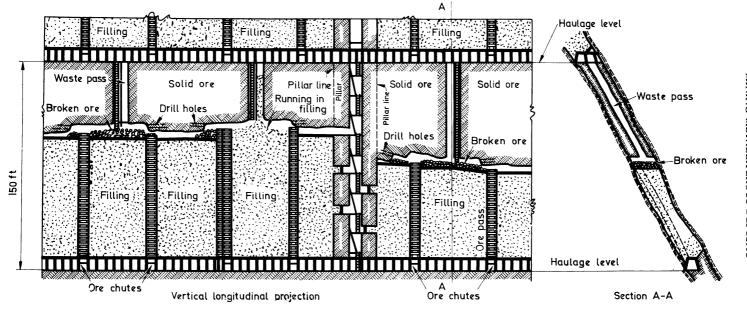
Example of horizontal cut-and-fill stoping.⁽⁸⁾
